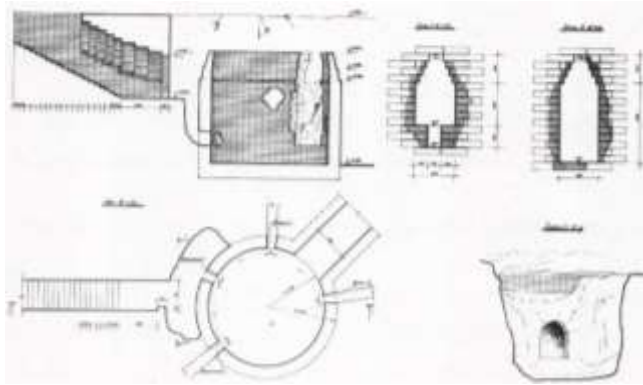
Plan and sections of sardoba (underground water reservoir) (after T. Khodjaniyazov)
